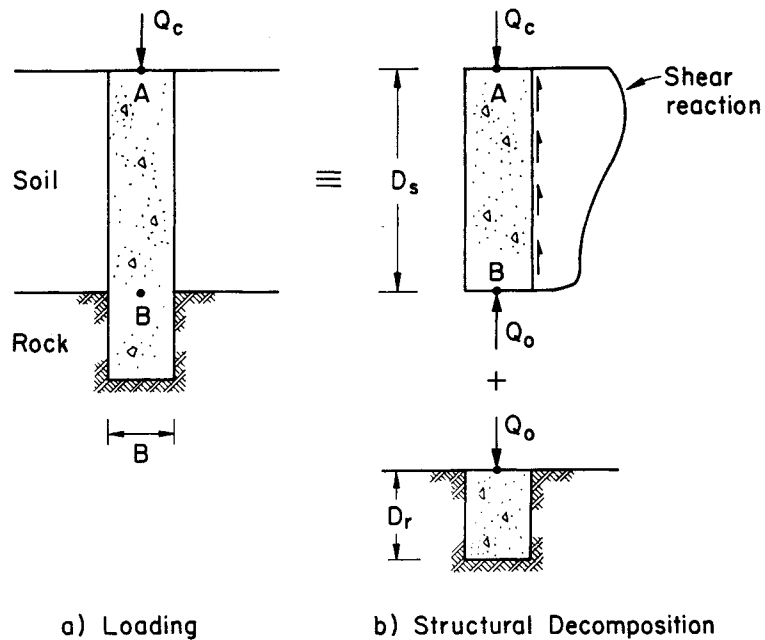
Rock Socketed Shaft in Compression with Overlying Soil Layer
